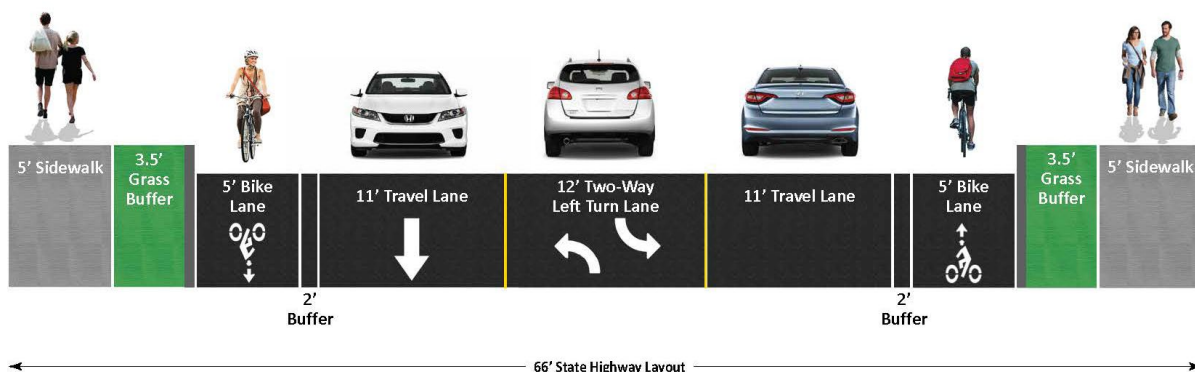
Typical Cross-Section of Main Street with Road Diet Improvements
